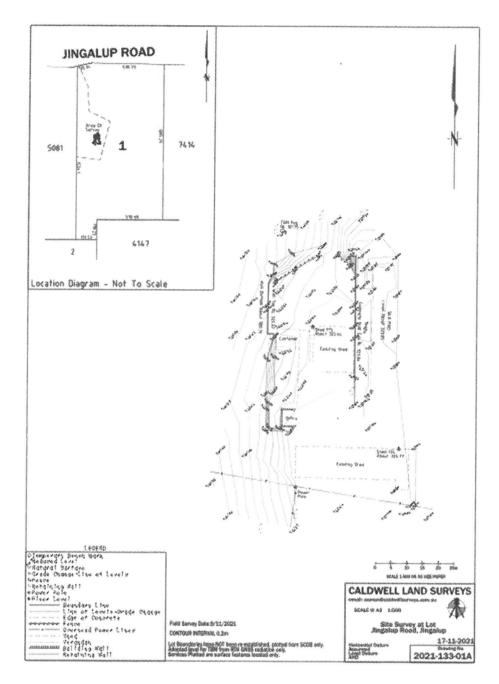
Proposed Site Layout – Farm Management Plan – Aus Oils Kojonup 1107 Jingalup Road, Jingalup
